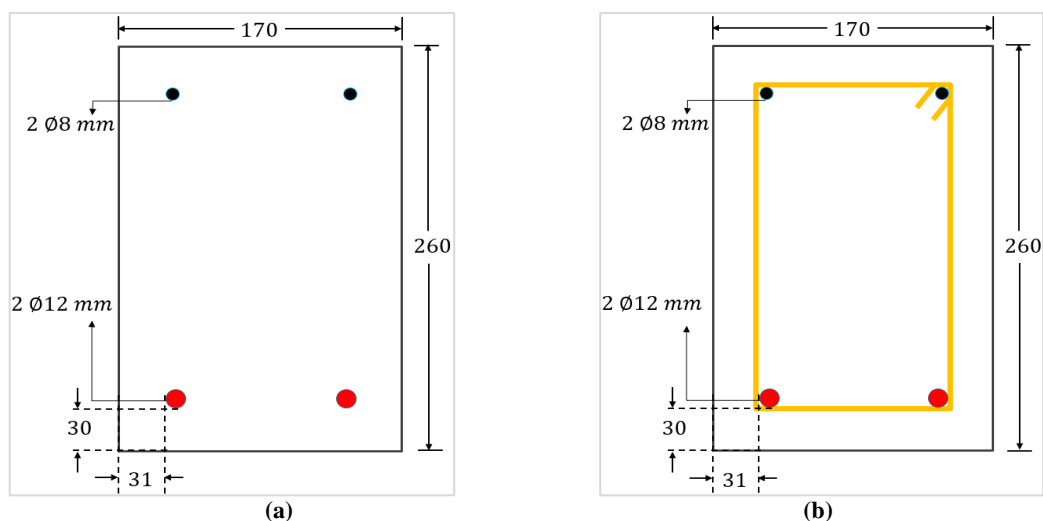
Cross sections of beams of group one (a) Cross-section A – A, b) Cross-section B – B
